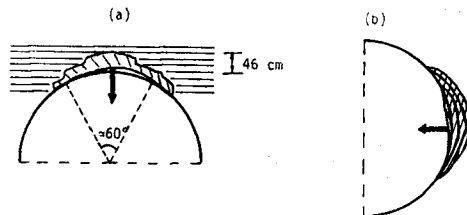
Tunnel instability occasionally encountered: (a) falling off at the roof of tunnel excavated in a high horizontal stress field (after Lo and Morton¹⁷⁾) and (b) rock burst at the side wall.
